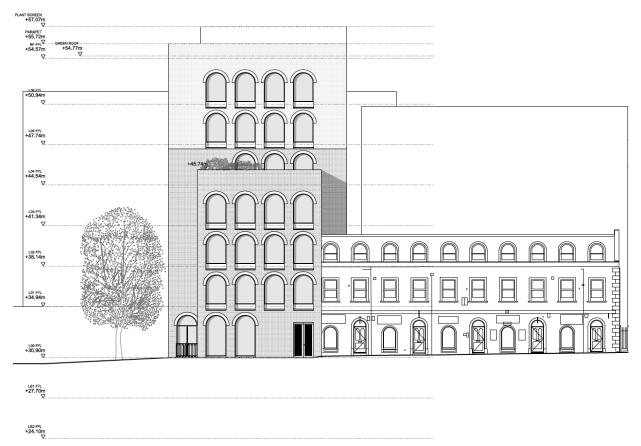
Proposed Development - Building Heights (north elevation) (not to scale)
